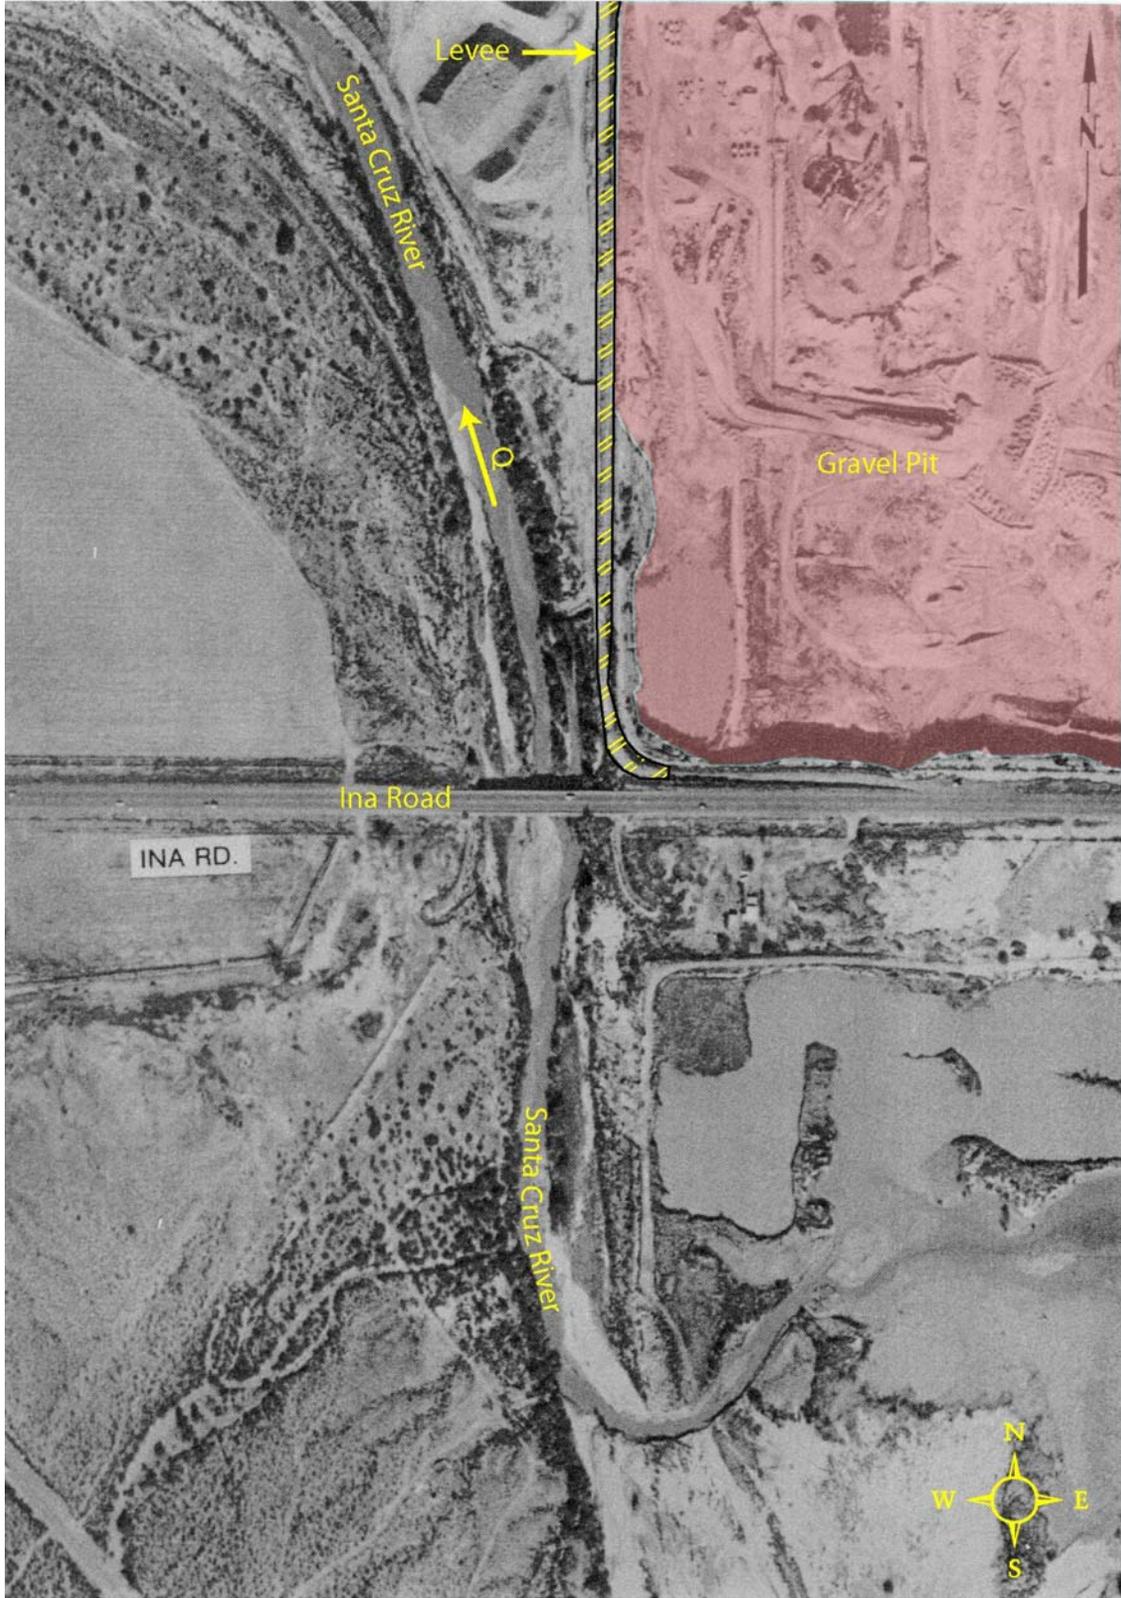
Ina Road Bridge site in December, 1982 (from PCDOT, 1984). Note the steep side walls and narrow setback from Ina Road at the Site #5 Pit, as well as headcut into the inundated pit south of Ina Road.
